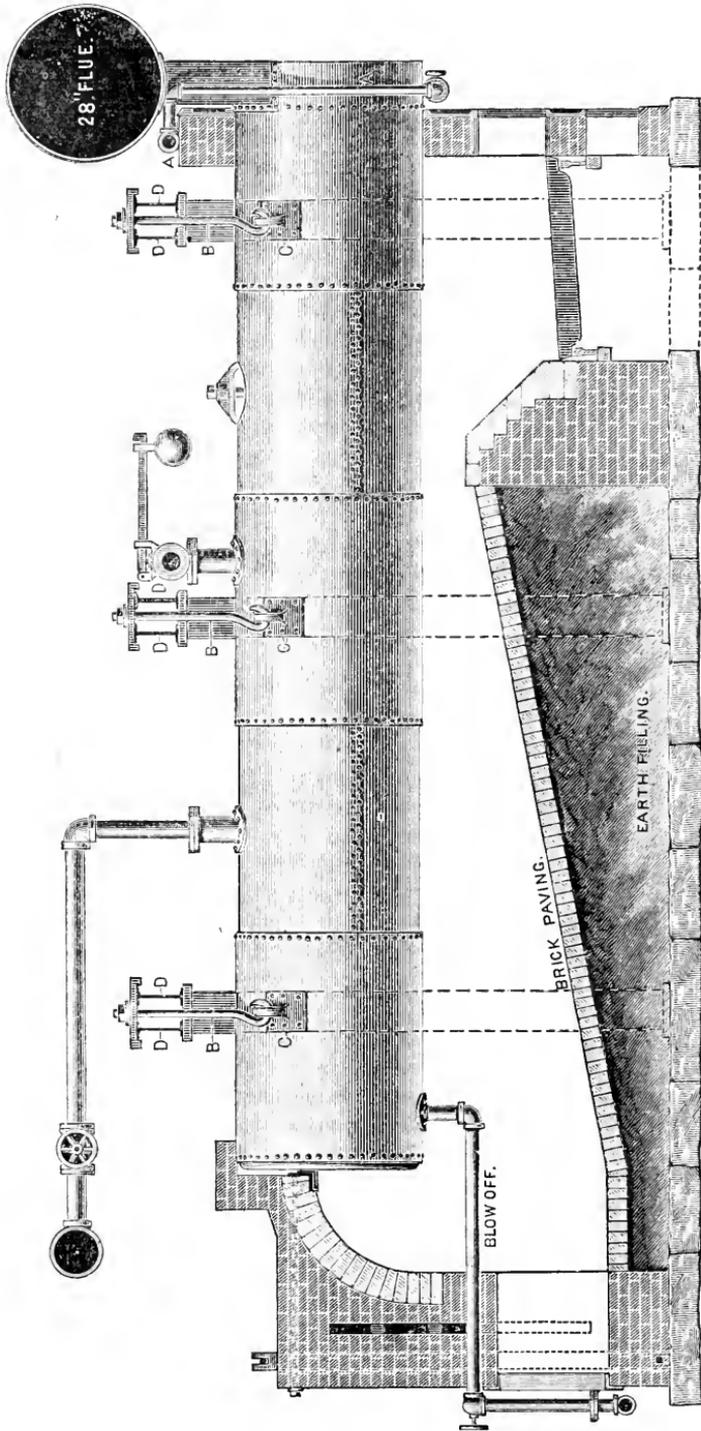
SETTING BOILERS OVER A SINGLE FURNACE.
